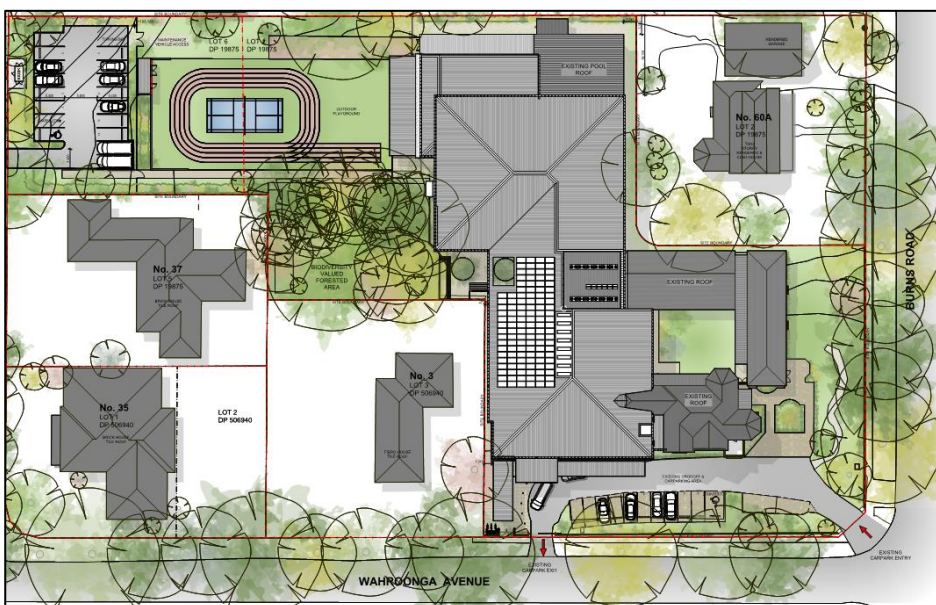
Site Plan – Proposed Plan (Source: GSA drawings dated 03.12.19)
